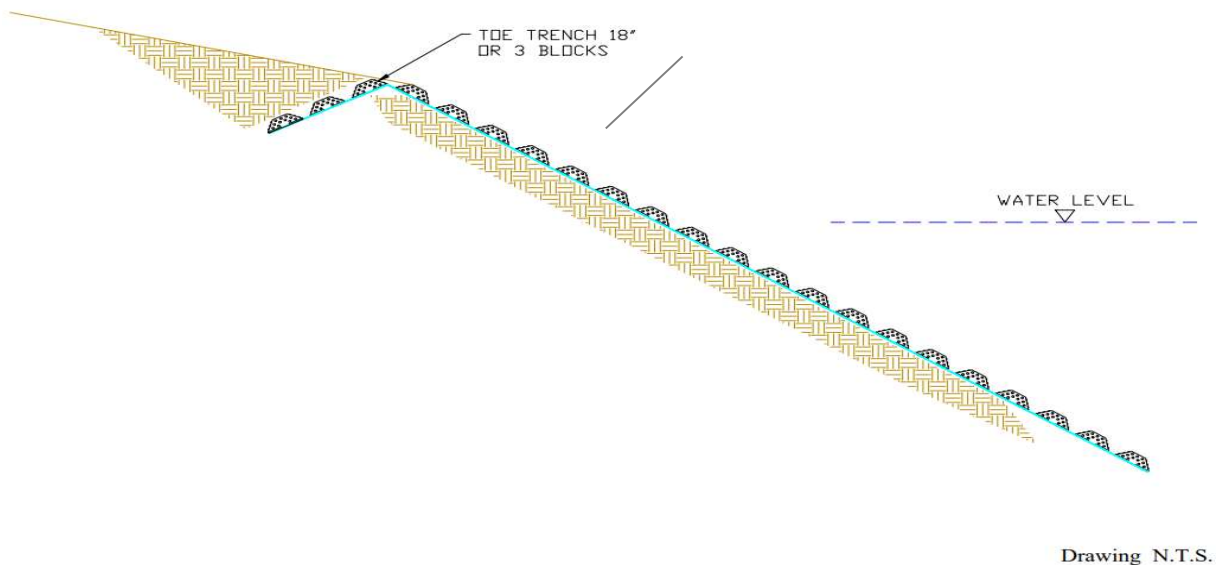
Typical section of an articulated concrete mat system, such as ShoreFlex®
